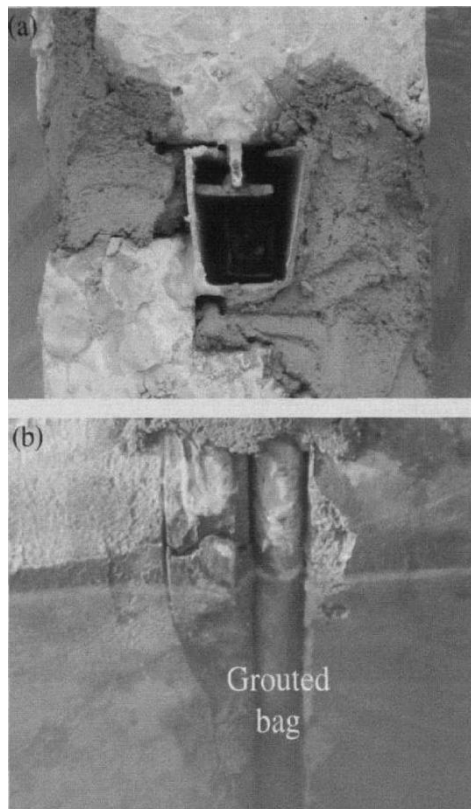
Photograph showing the steel tube and I-beam and internal spaces between two concrete sheet piles isolated with two grouted plastic bags within the two circular cylindrical bores.(a)Top view of isolated tube and wall gap.(b)Front view of a grouted plastic bag between two sheet piles
